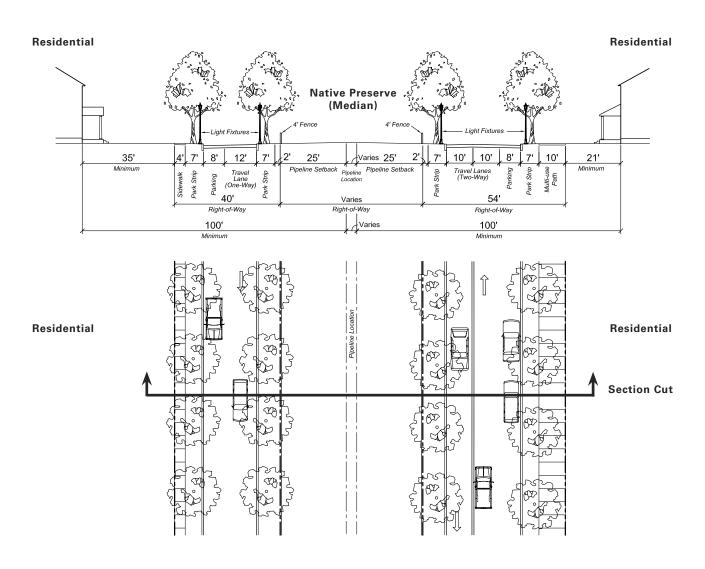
Proposed Section and Plan: Neighborhood Street G
